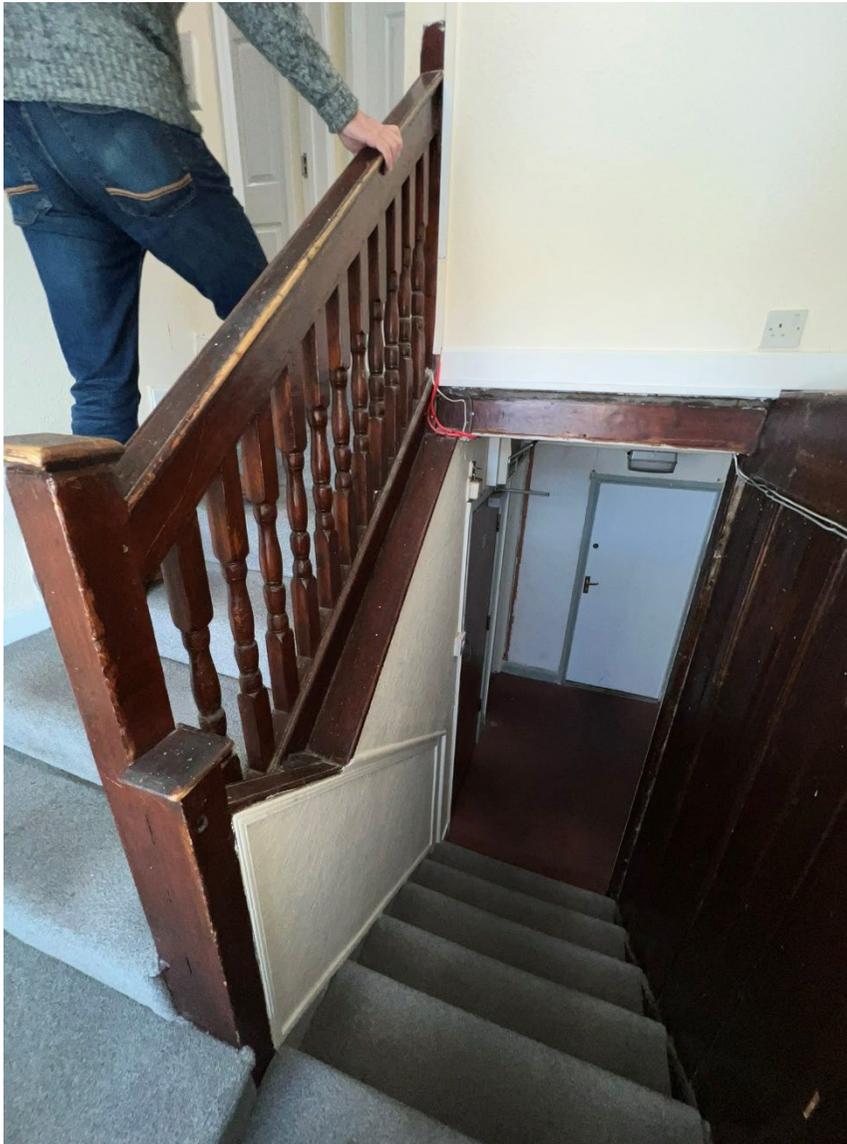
Main Range, First Floor/Second Floor half landing, centre, rear (view from south) showing general arrangement and separation of lower leg from stairwell down to ground floor pub (left)
